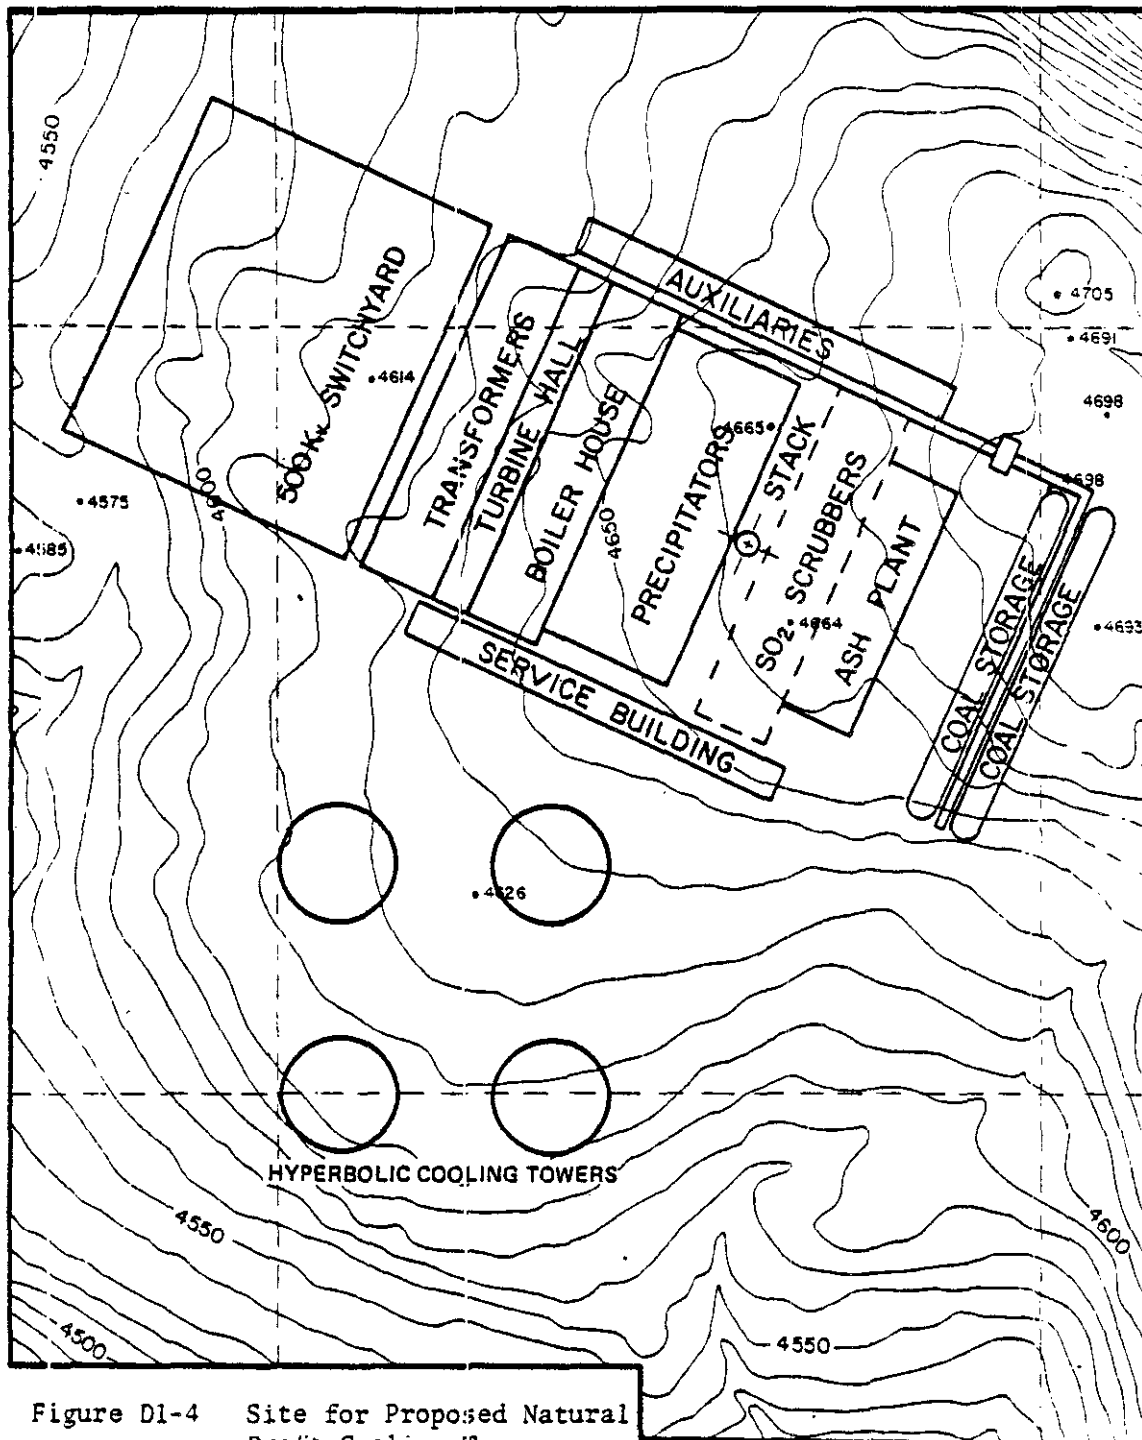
Site for Proposed Natural Draft Cooling Tower (Four Towers) Relative to Other Power Plant Installations
